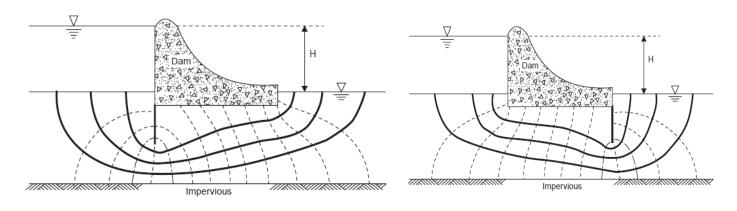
Concrete dam with cut-off at heel wall at toe
